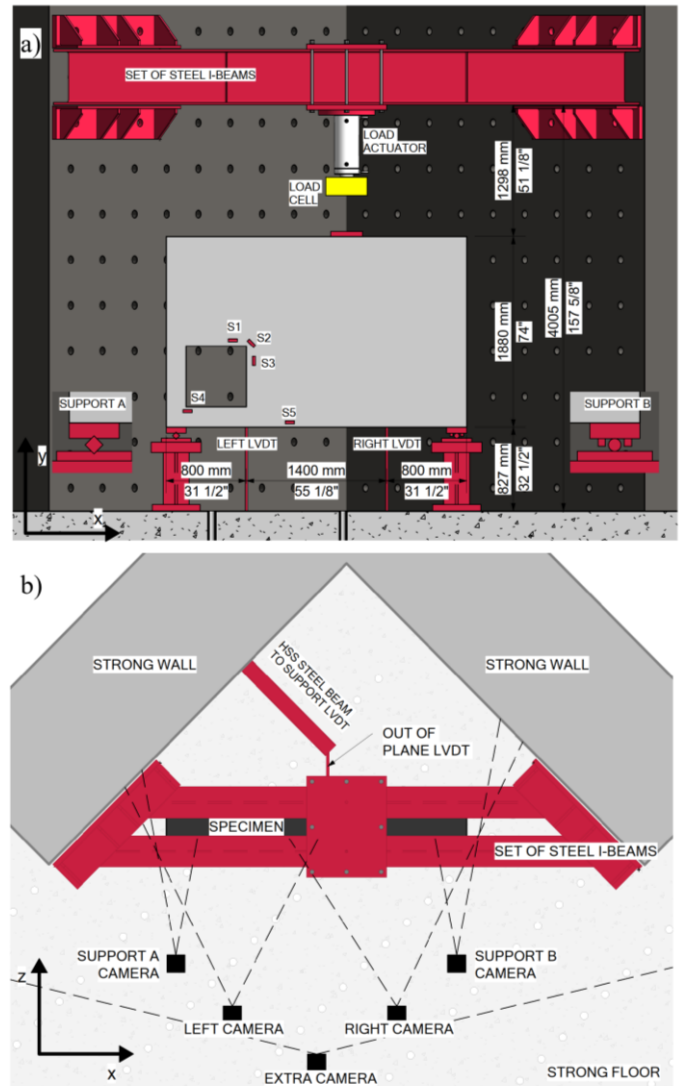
Test setup scheme a) front elevation; b) plan view.
